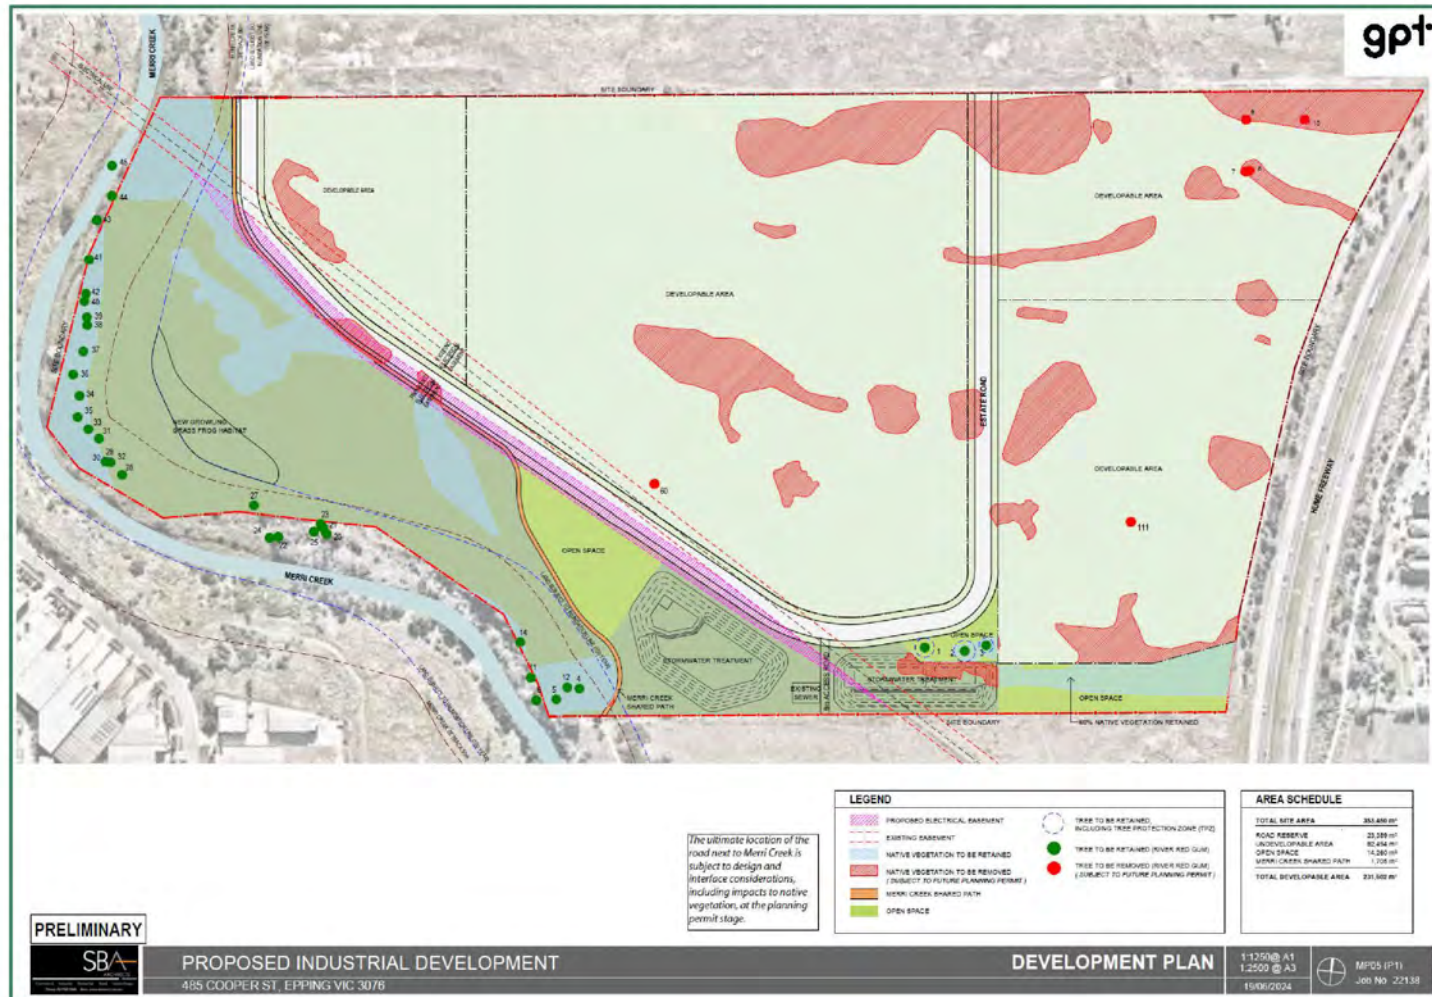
DEVELOPMENT PLAN LAYOUT INCLUDING INDICATIVE STAGING
